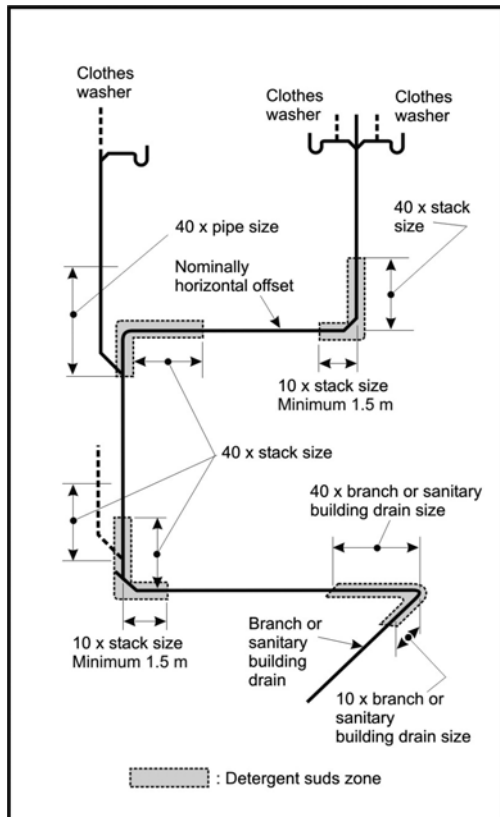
(5) Soil-or-Waste Pipe Connections;
